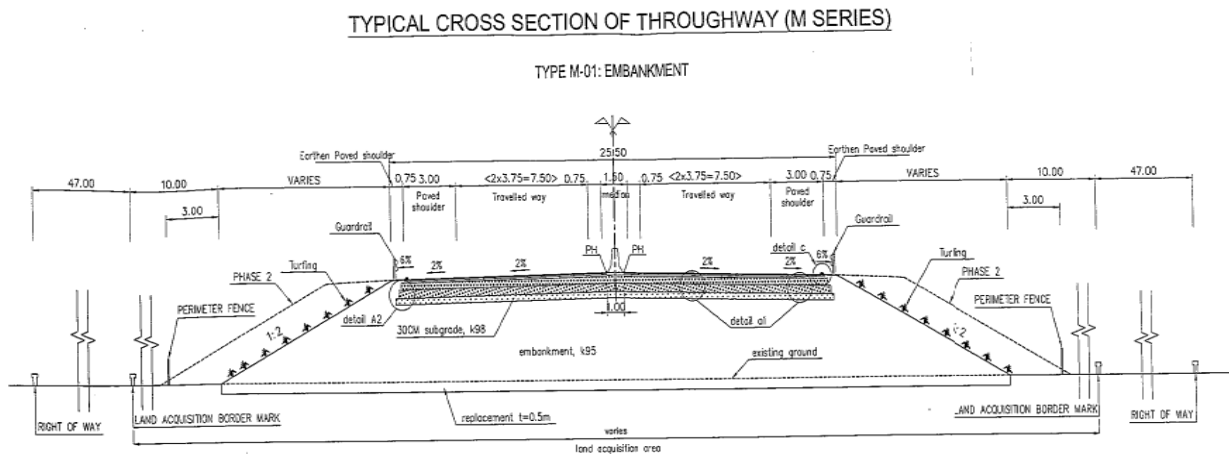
Typical Cross Section of Embankment Section ( $H \geq 10m$ )
